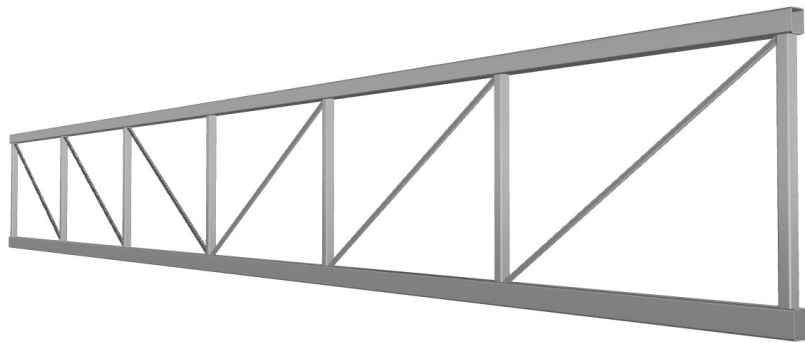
/ 3D view of the prefabricated welded truss beam
